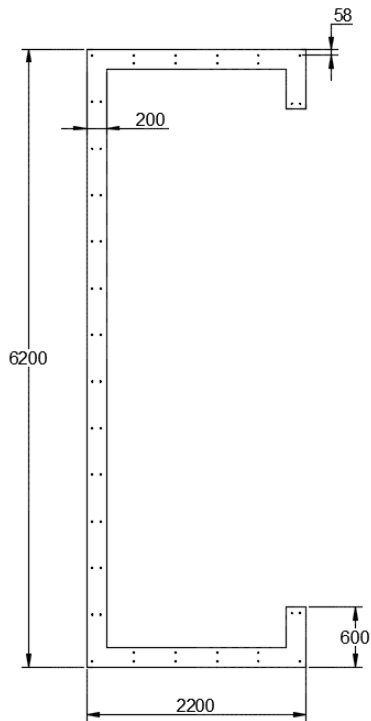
STAIR AND LIFT CORE DESIGNS FOR ARCHETYPE BUILDINGS
